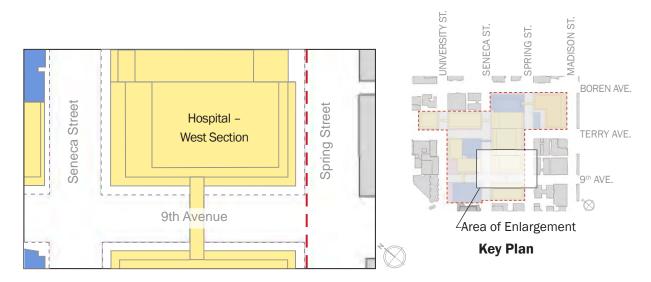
Proposed Building Setbacks – Central Hospital Block – West Section
